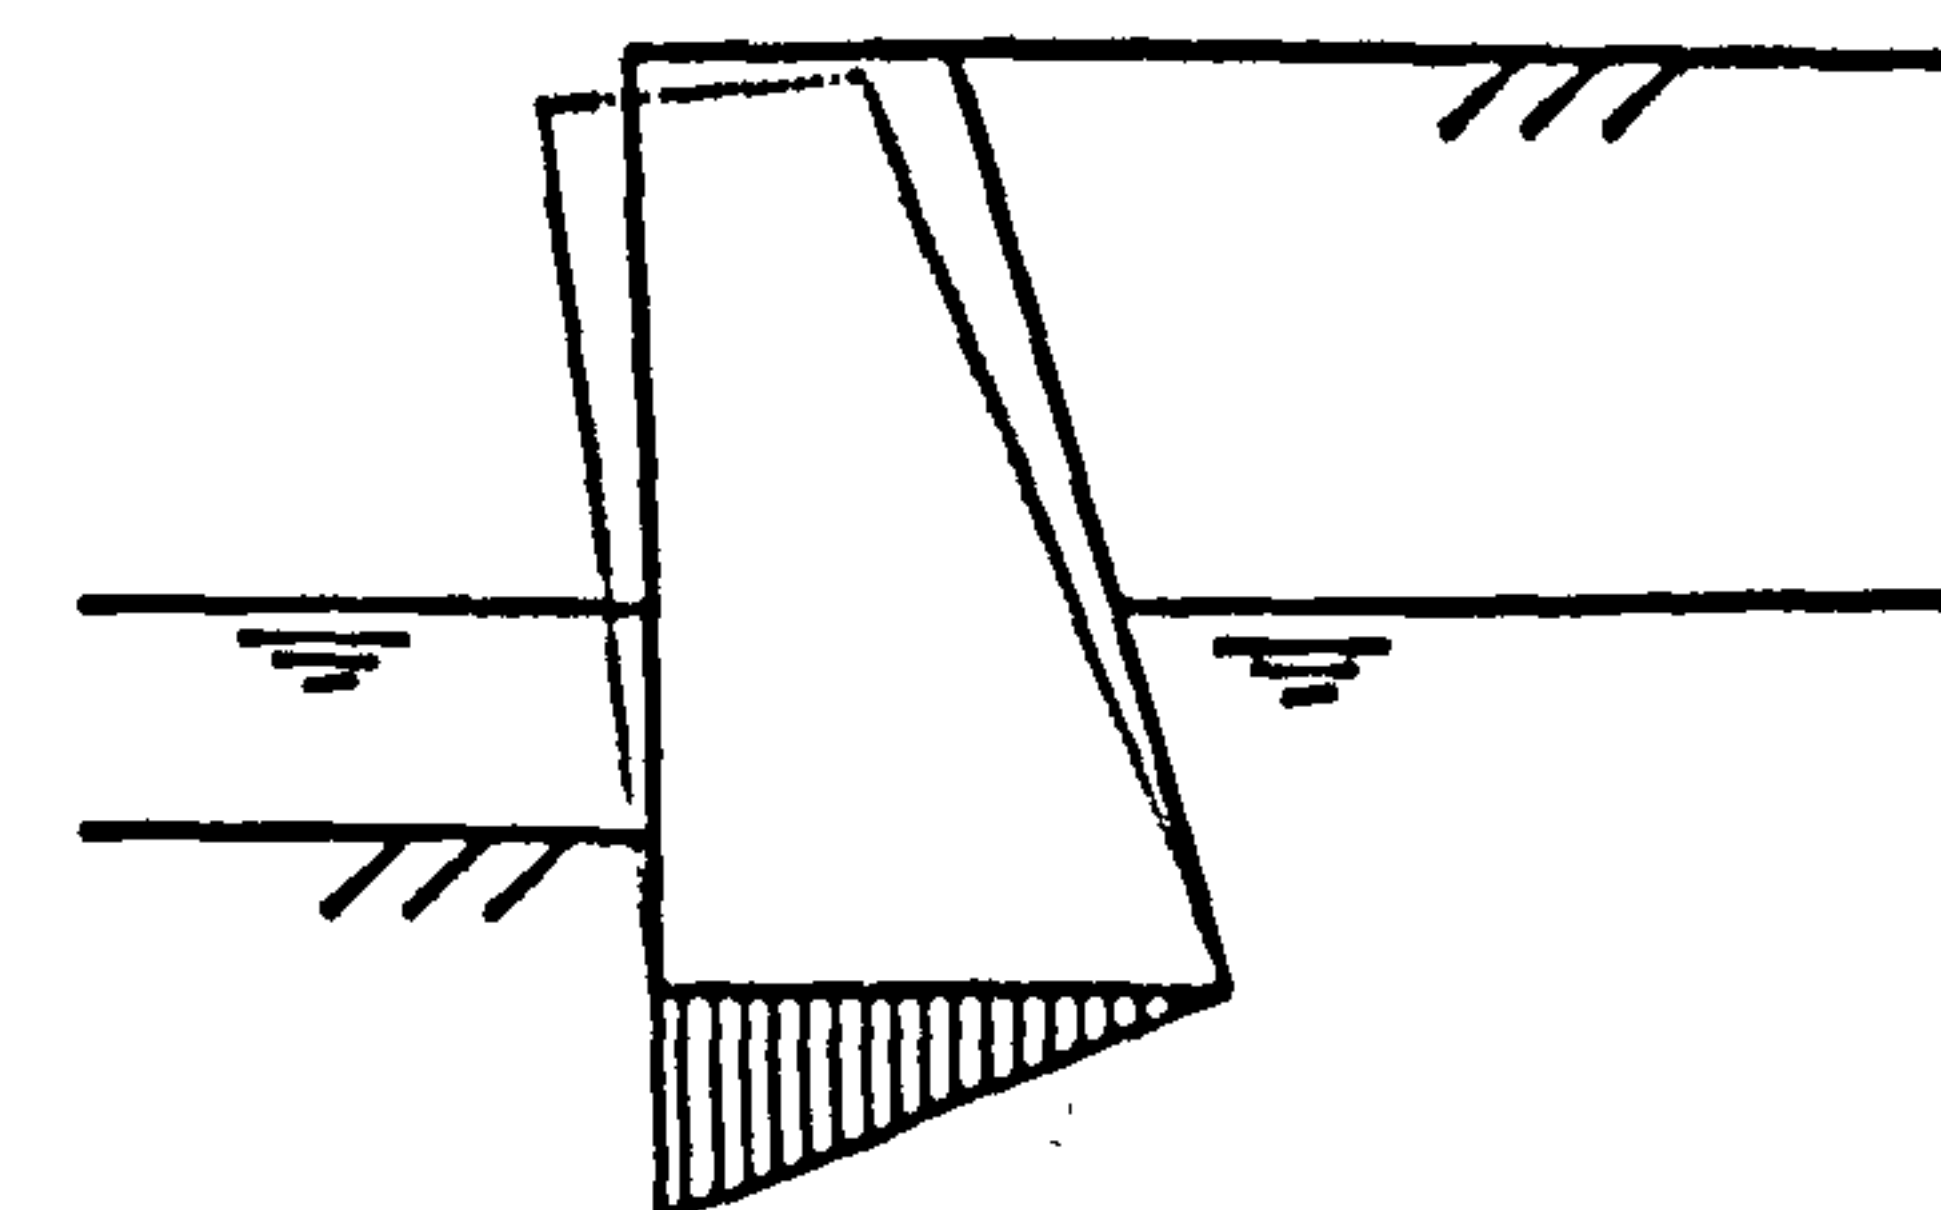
Gravity wall failure due to bearing pressure
